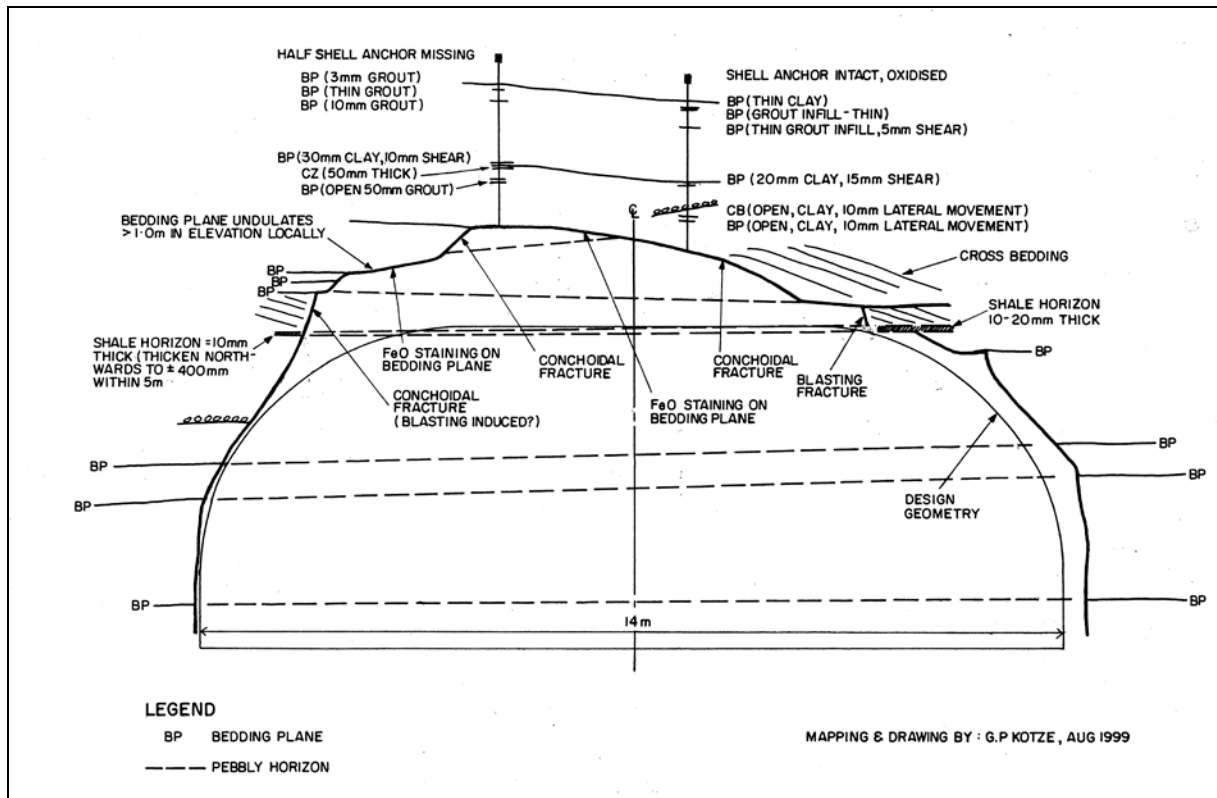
Roof Failure – Gas Storage Cavern
